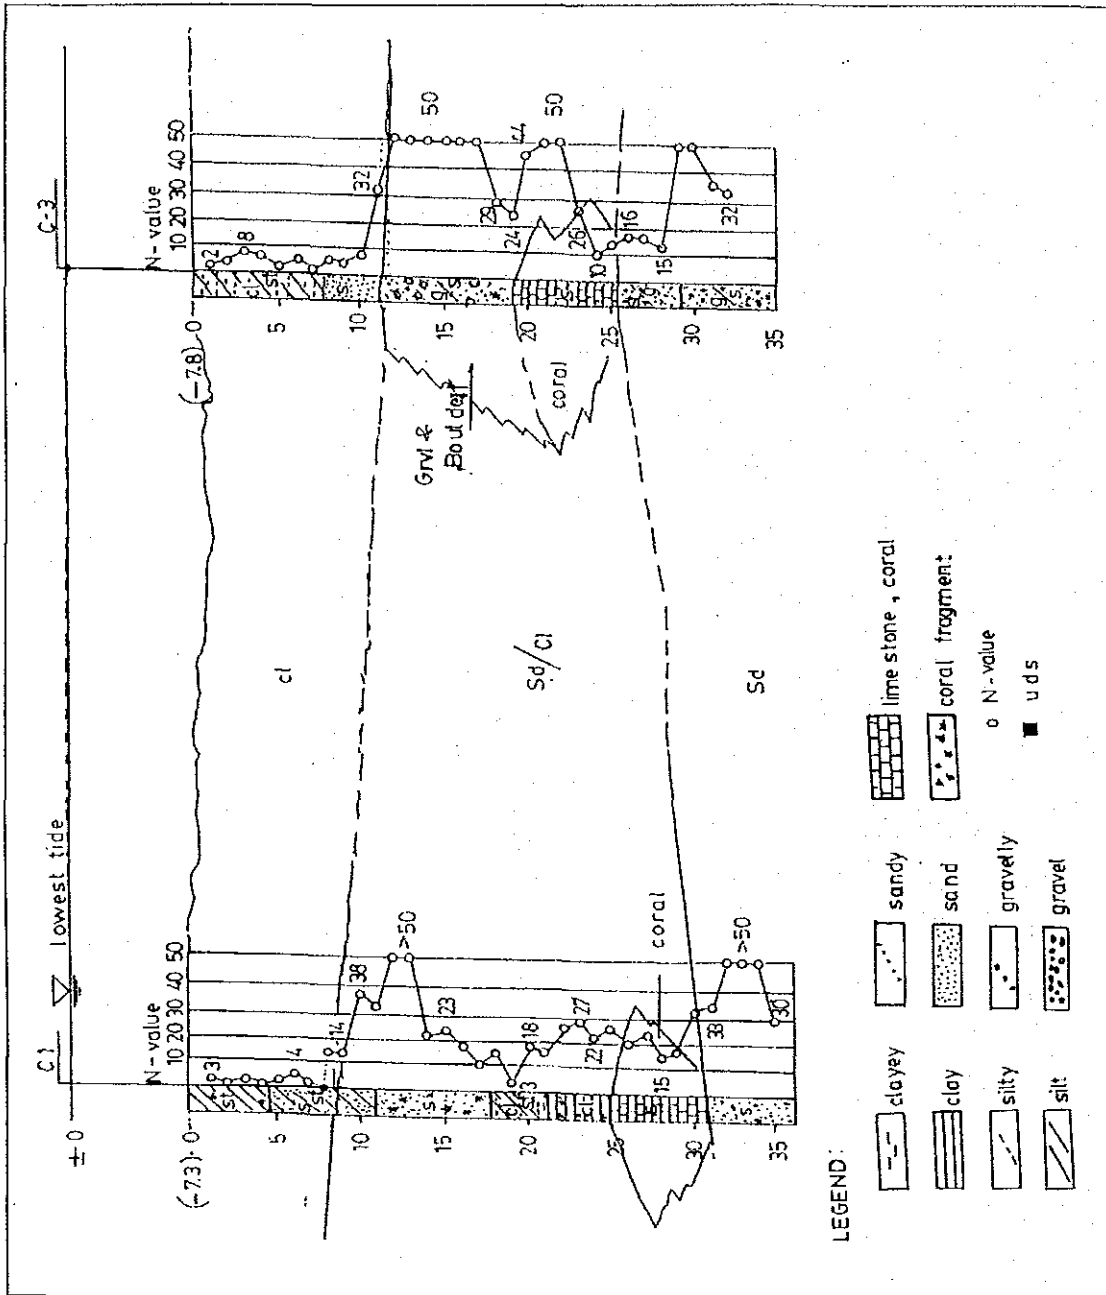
Soil Profile in Consolacion Site (2/2)
